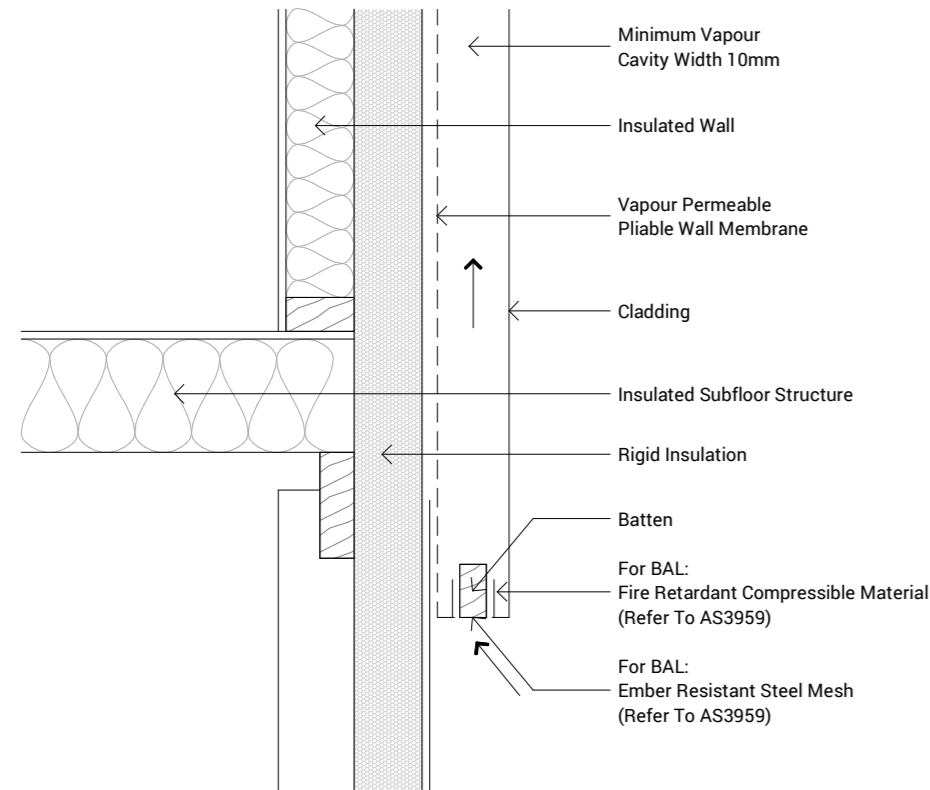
SUSPENDED TIMBER FLOOR WITH HORIZONTAL BATTENS AND RIGID INSULATION
